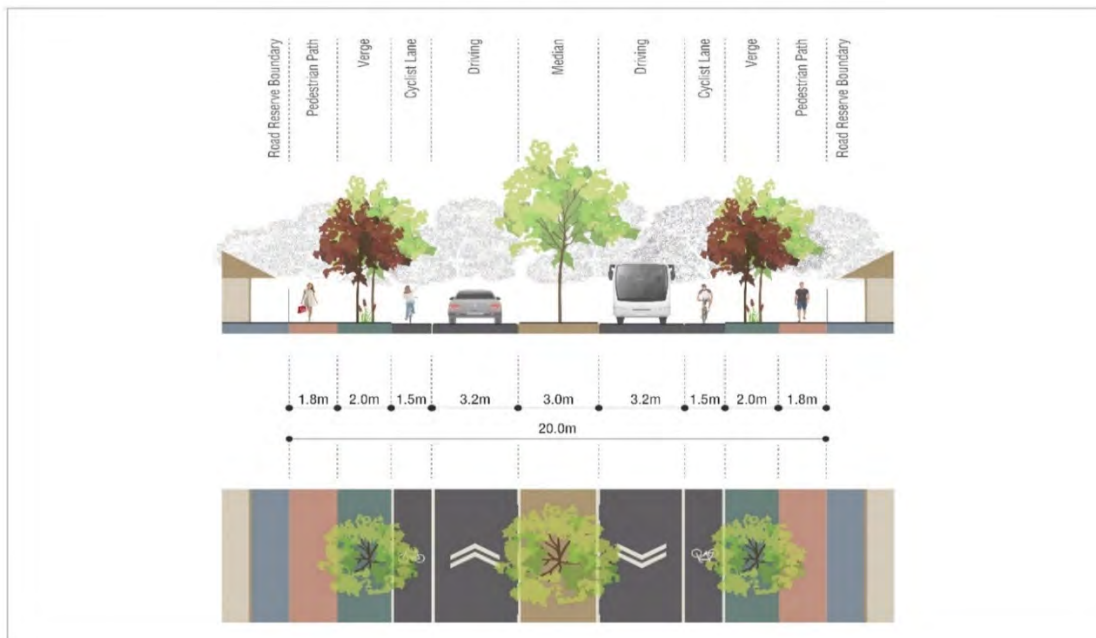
RD06 Dundas Road (South of Berkshire Road), RD07 Dundas Road (Berkshire Road to Dundas Road Old) and RD08 Dundas Road (North of Deviation) Cross Section
